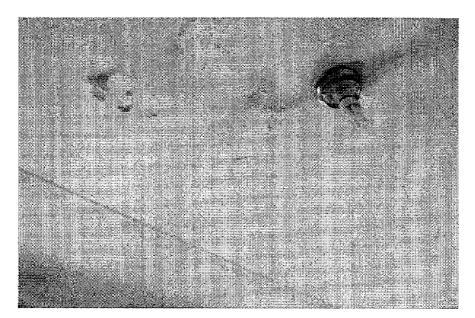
White paint with elevated levels of lead located on the ceilings of residential tenancy 91A Liverpool Road.
